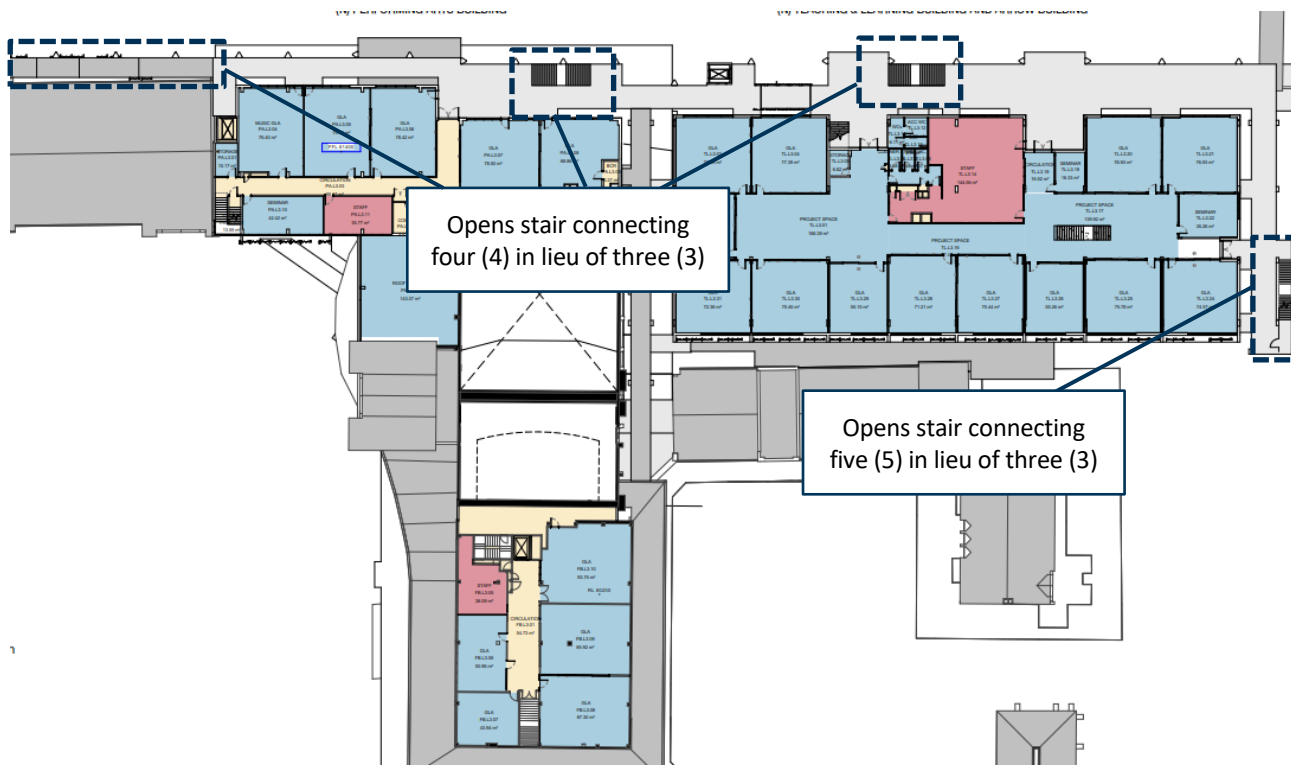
Open stairways (Arrow Building Stairs L3 shown)
